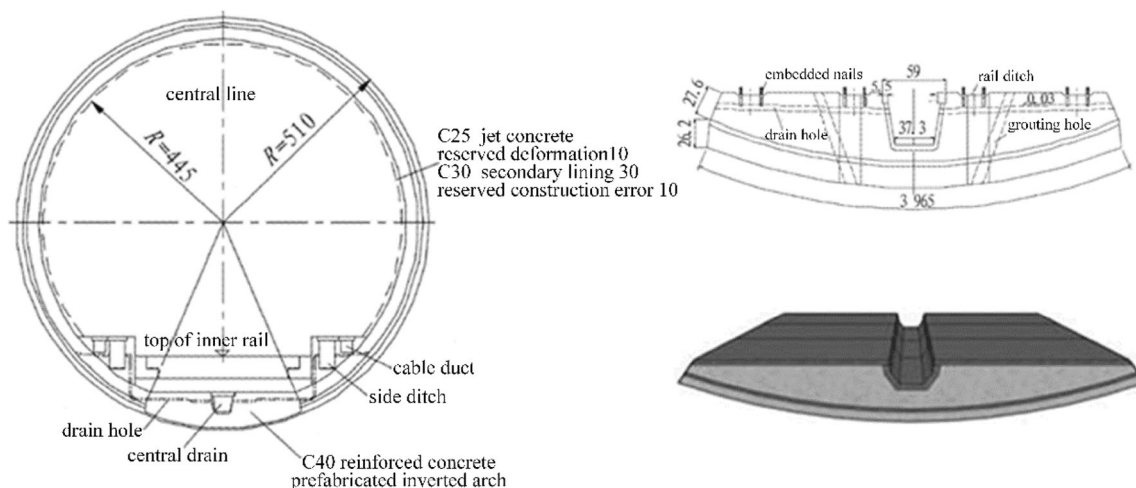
Prefabricated inverted arch structure of Qinling tunnel
